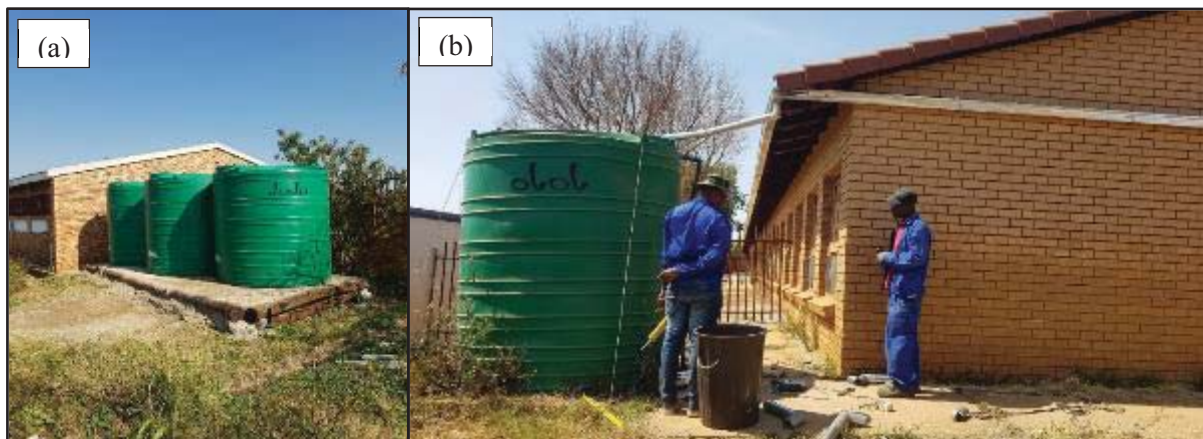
Concrete slab constructed to support water storage tanks (a) and gutter installation for rooftop runoff collection (b) at the study schools.
